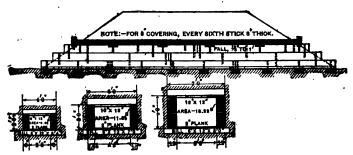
Standard Timber Box Culvert. C., M.& St. P.Ry. (Feb. 1889.)
